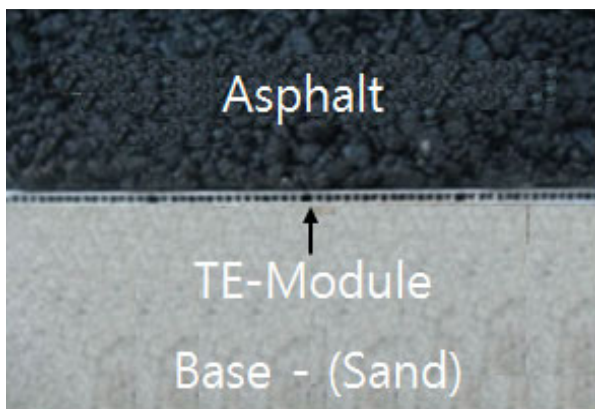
TE-Module Embedded in the Asphalt Pavement and Ground Floor (Jo et al., 2011)
